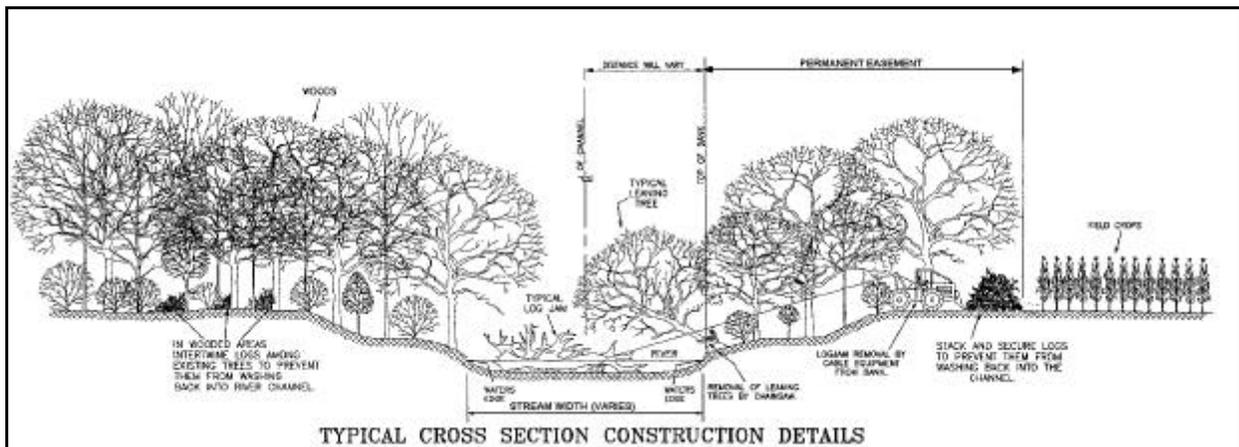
Typical Cross-Section Construction Detail (Source: NRCS Files)
